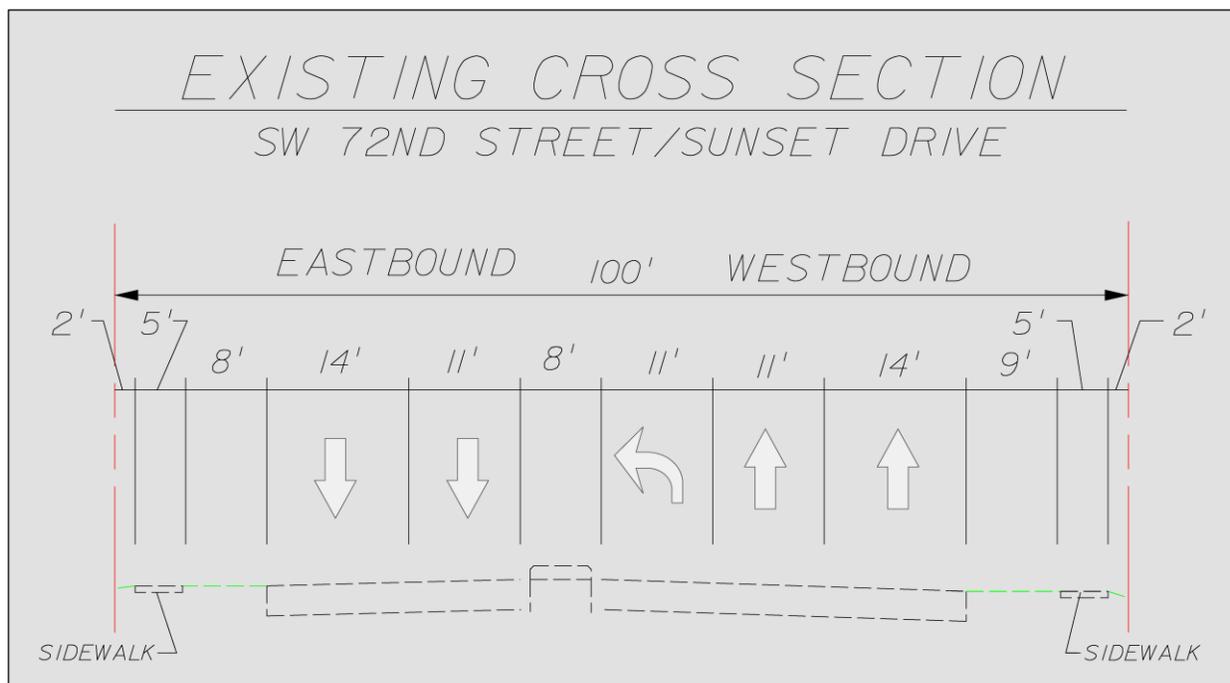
1: Existing Roadway Typical Section along Sunset Drive
